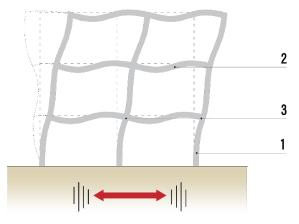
A column (1) and beam (2) frame building moves sideways during an earthquake. Note that both columns and beams bend. They are connected at strong joints where they meet (3).
